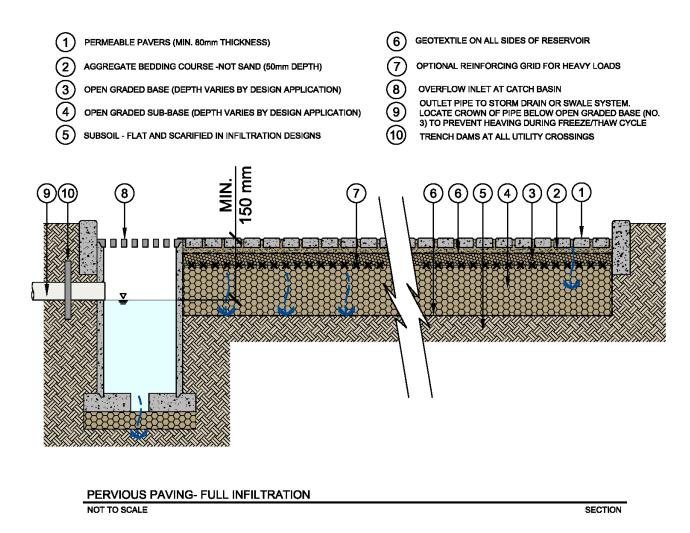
Pervious Paving – Full Infiltration (Not to scale, Section)
